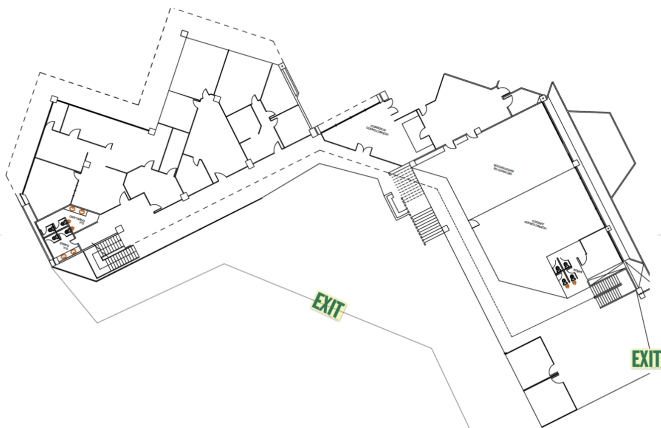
Schematic of the First Floor of the ESPOL's Administrative Building
